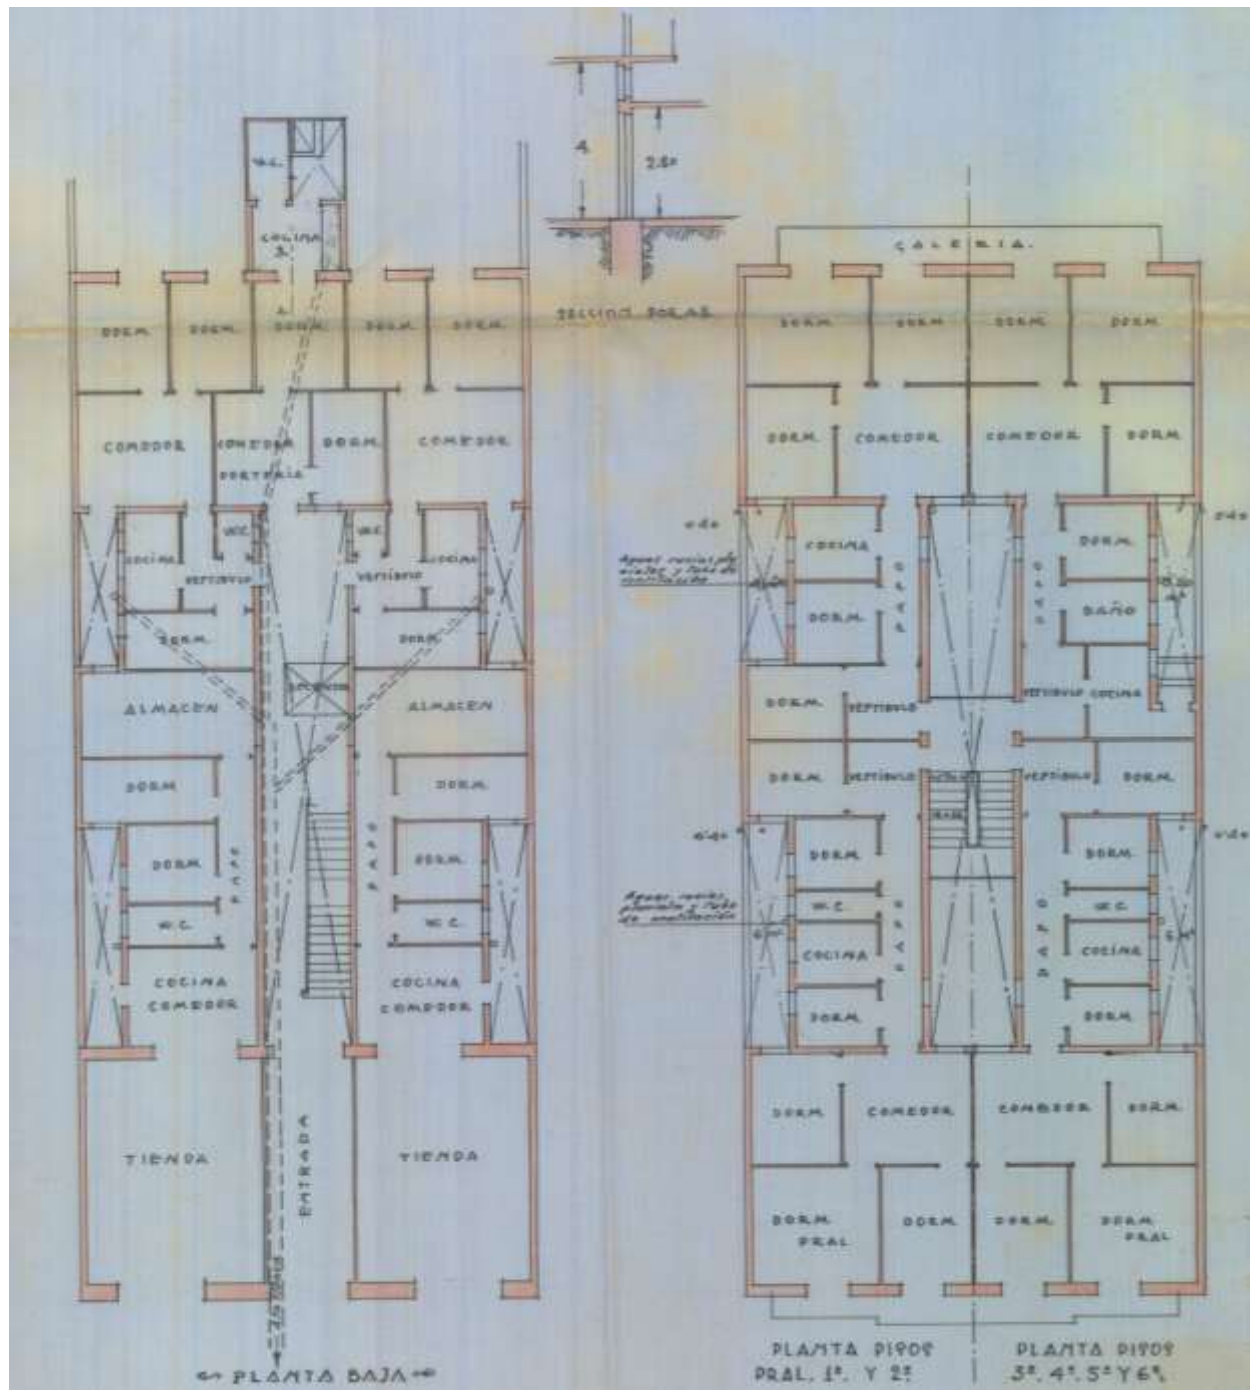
Floor plans of masonry building of Villarroel Street 231.
